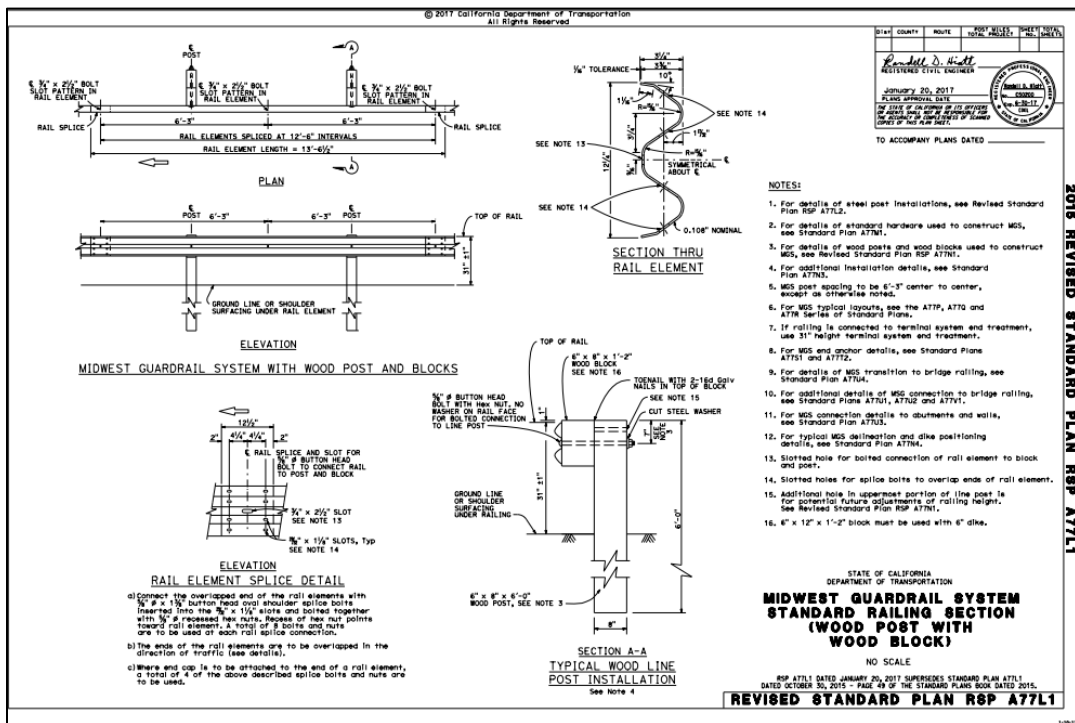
Standard Plan RSP A77L1 Midwest Guardrail System [5].
